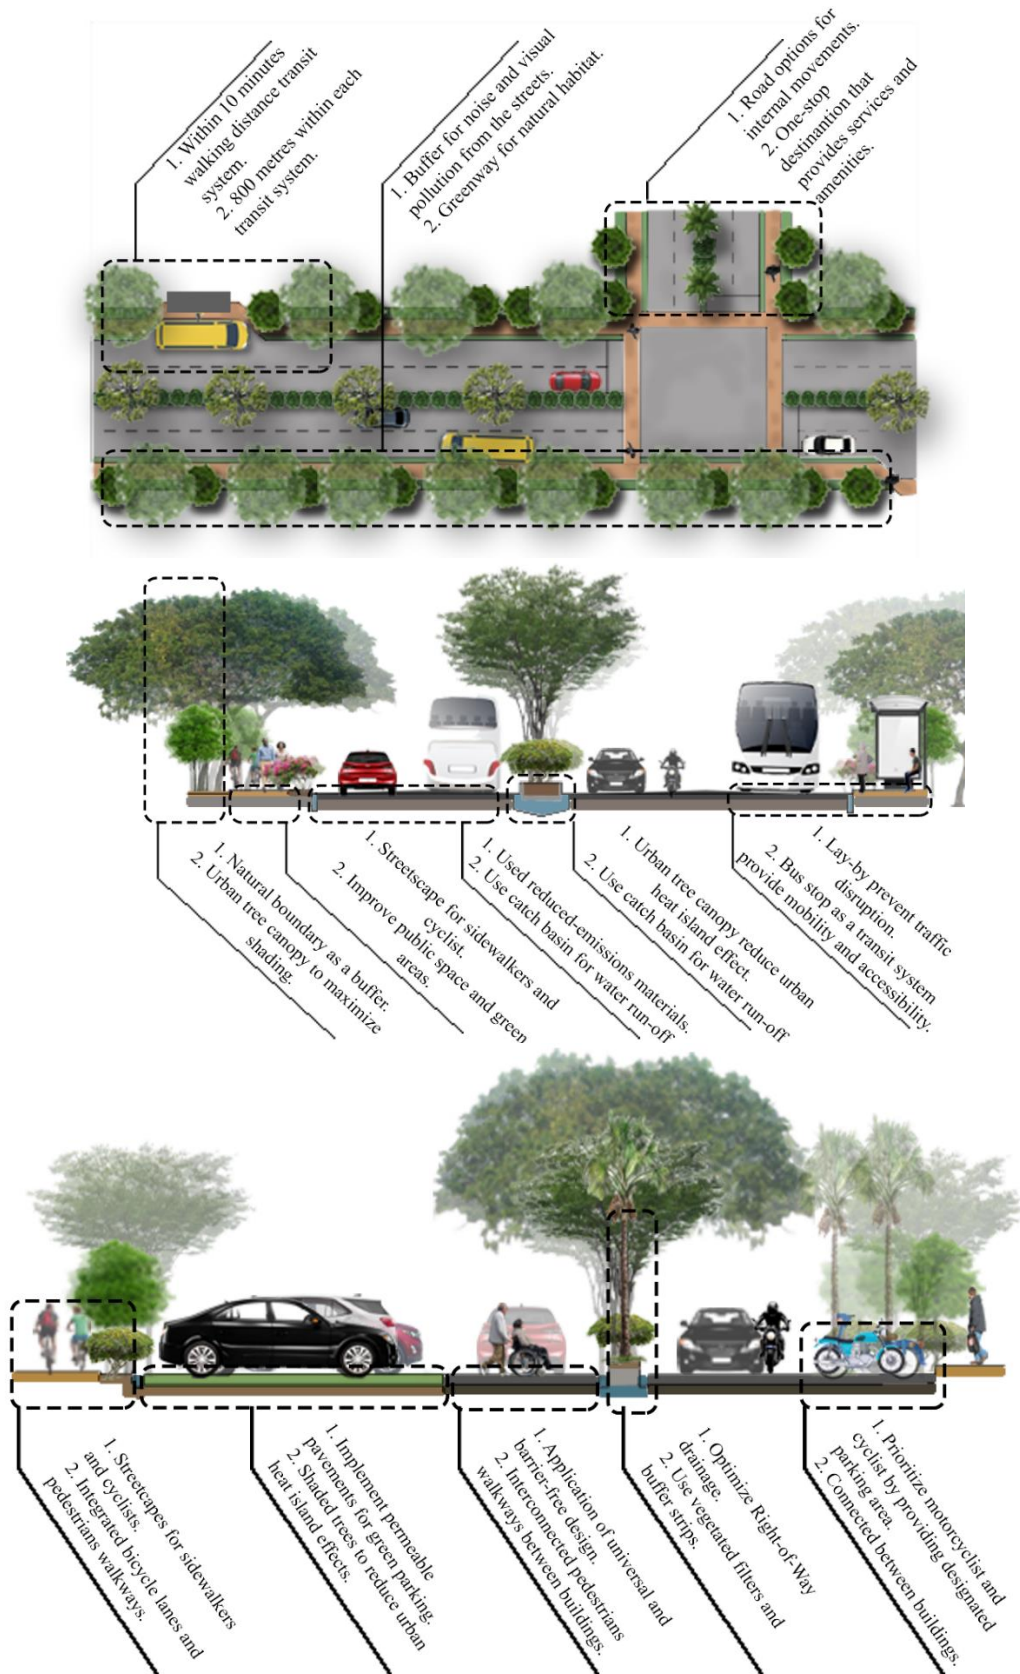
Plan and section views of the street design layout at the intersection of minor and secondary streets of Ukay Perdana showing recommendations for the streets
